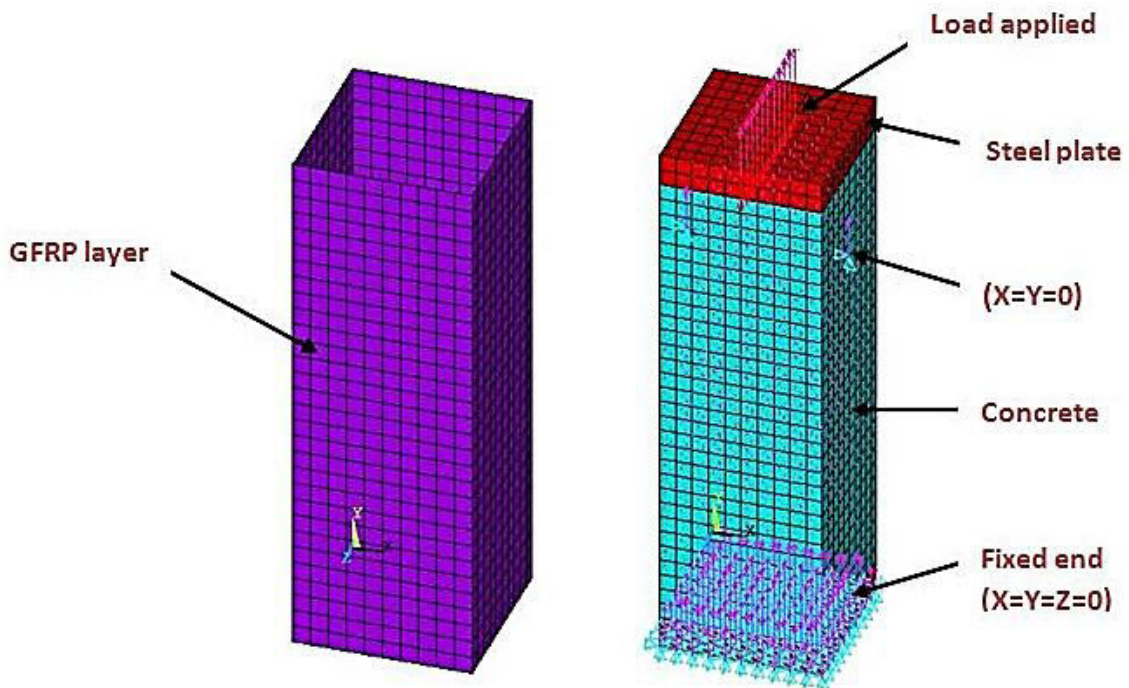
Finite Element Model of (S1R1) Concrete Column.
